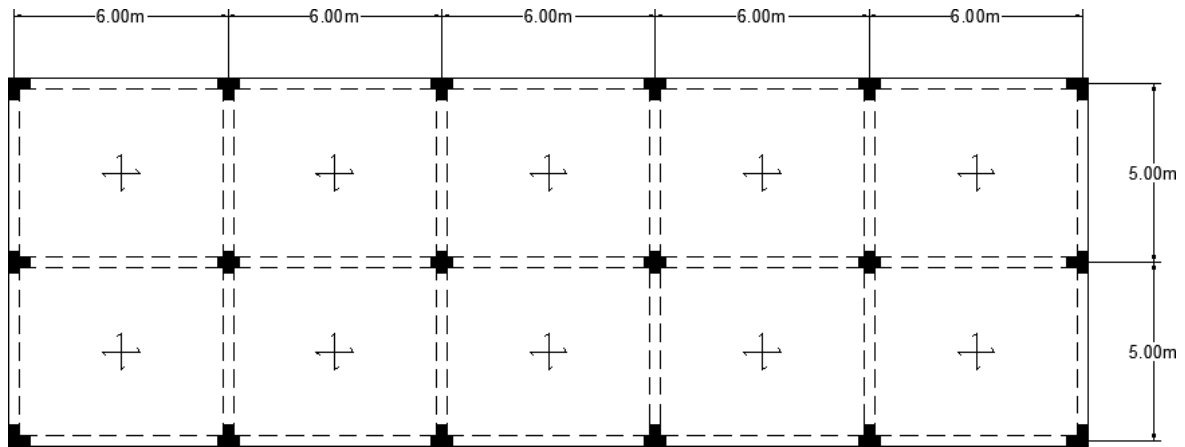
General Frame Plan of Structure with Irregularly-Shaped Columns
